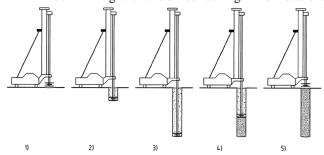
Diagram for dry mixing works: 1) mixer installation; (2) - 3) mixer immersion; (4) - 5) mixing with binder
